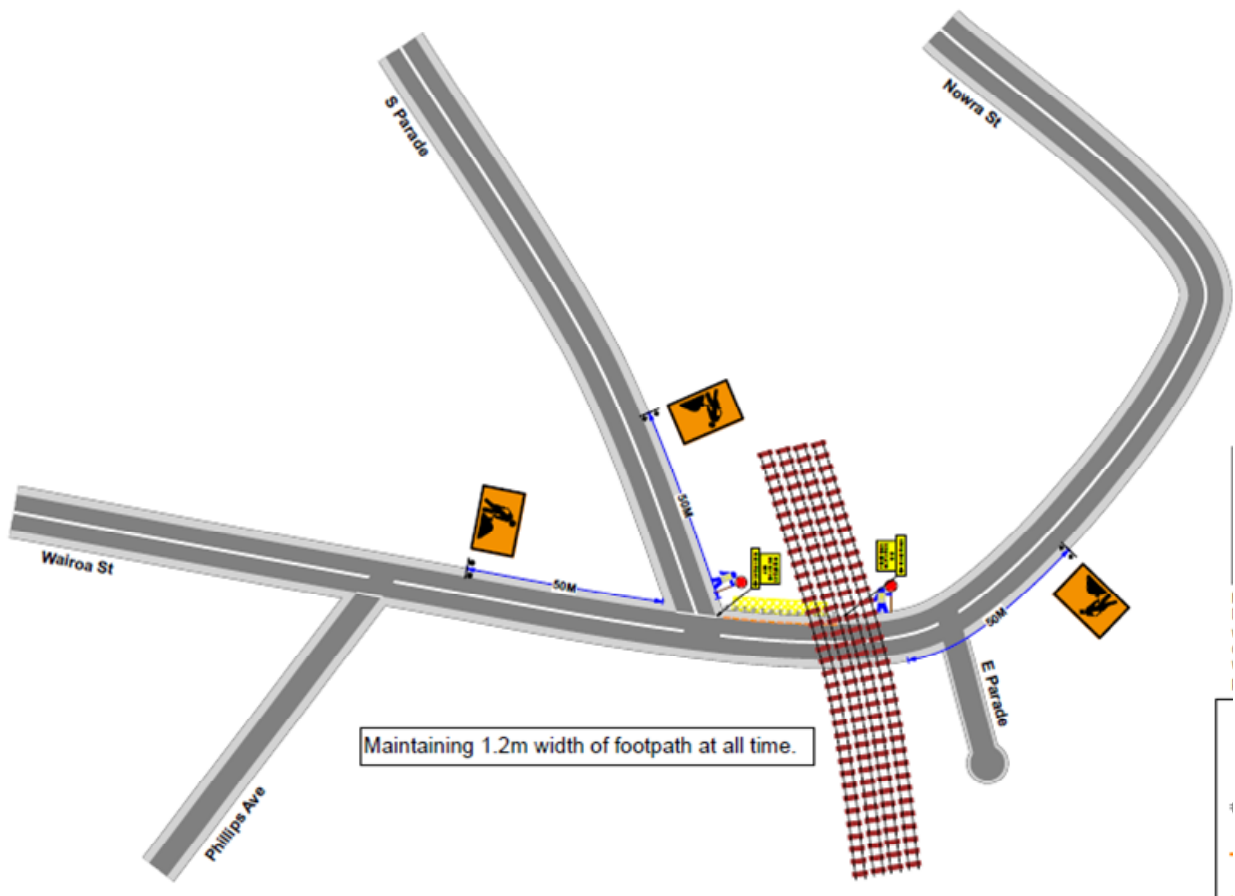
Wairoa St Pedestrian Hoarding Plan
